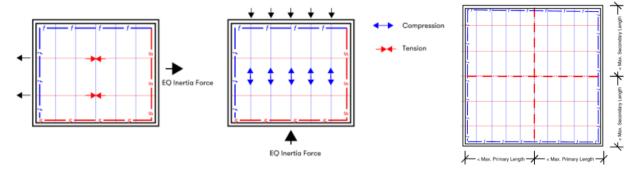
Plan view of small rooms with fixed (f) and floating (s) edge connections (left), medium sized room fixed to walls with central seismic gap (right)
